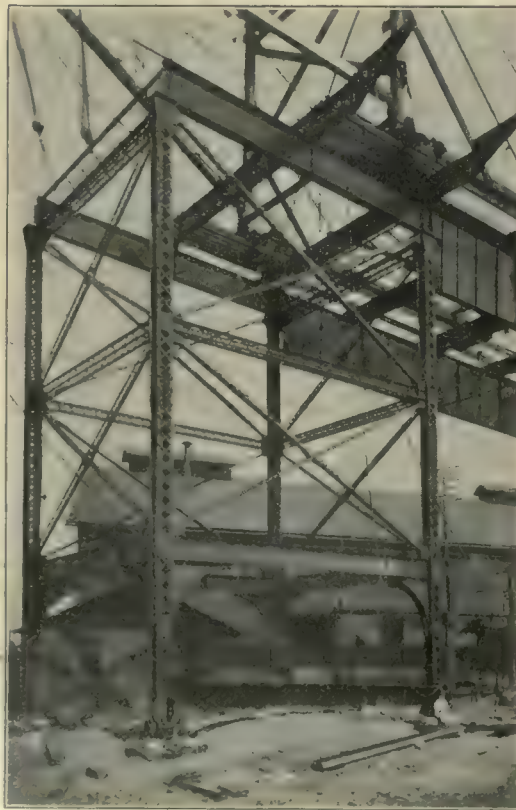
COLUMN BRACING AND CONNECTIONS.
